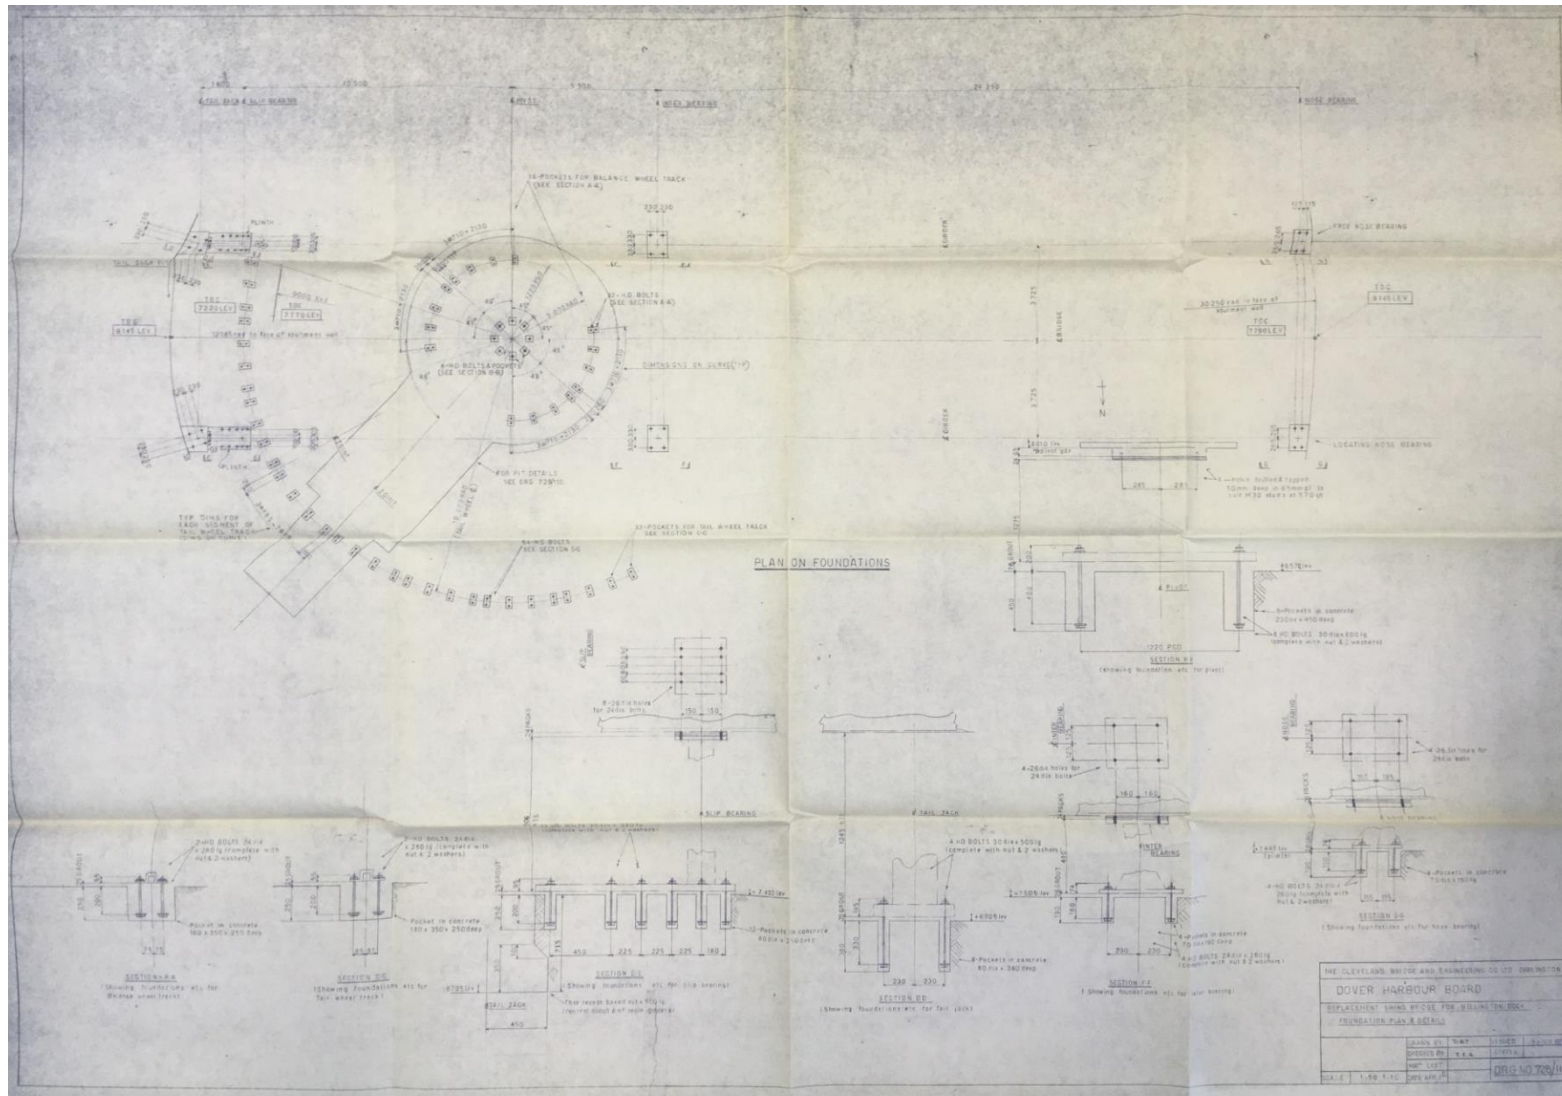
Replacement Swing Bridge for Wellington Dock, Foundation Plan and Details, Dated 30/03/1977, DHB Historical Drawing Archive Drawing Ref: 728/11.
